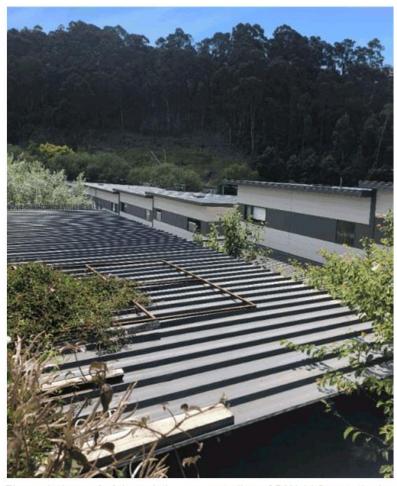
the roof of the existing yoga studio at 25 Weld Street, the location of the proposed extension.
